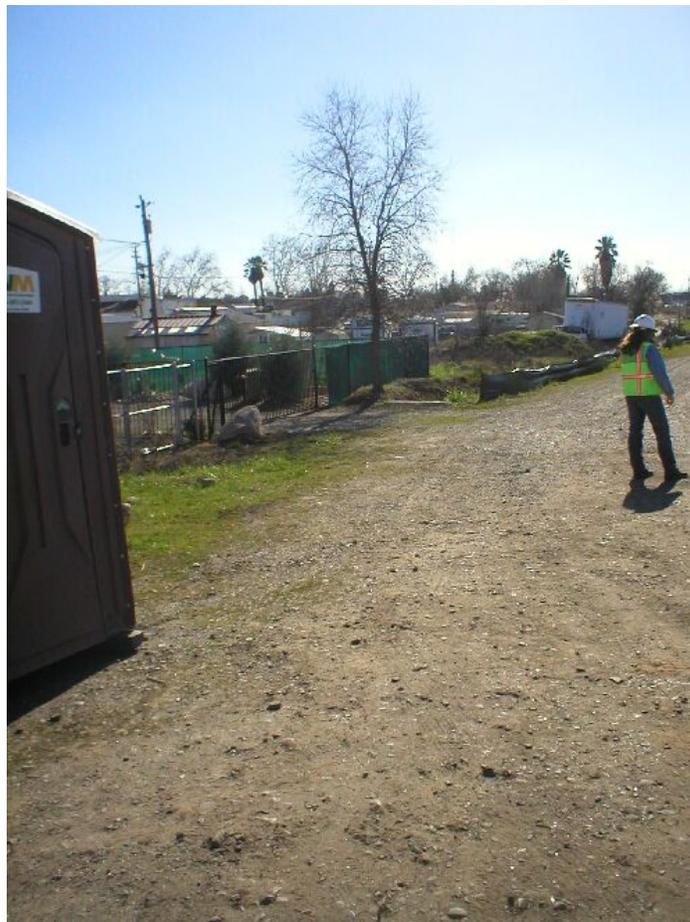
Portable restroom facilities upslope of Drainage #30, February 16, 2006.
